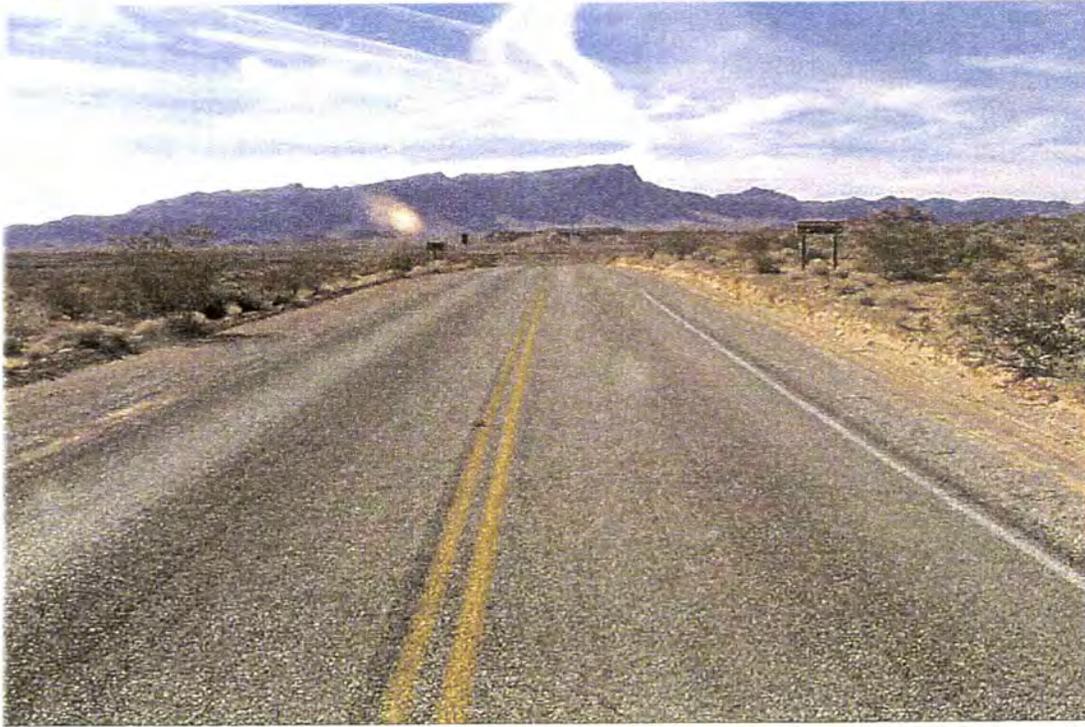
MP 0.00 - Begin at Rte 011, Typical Pavement Section
